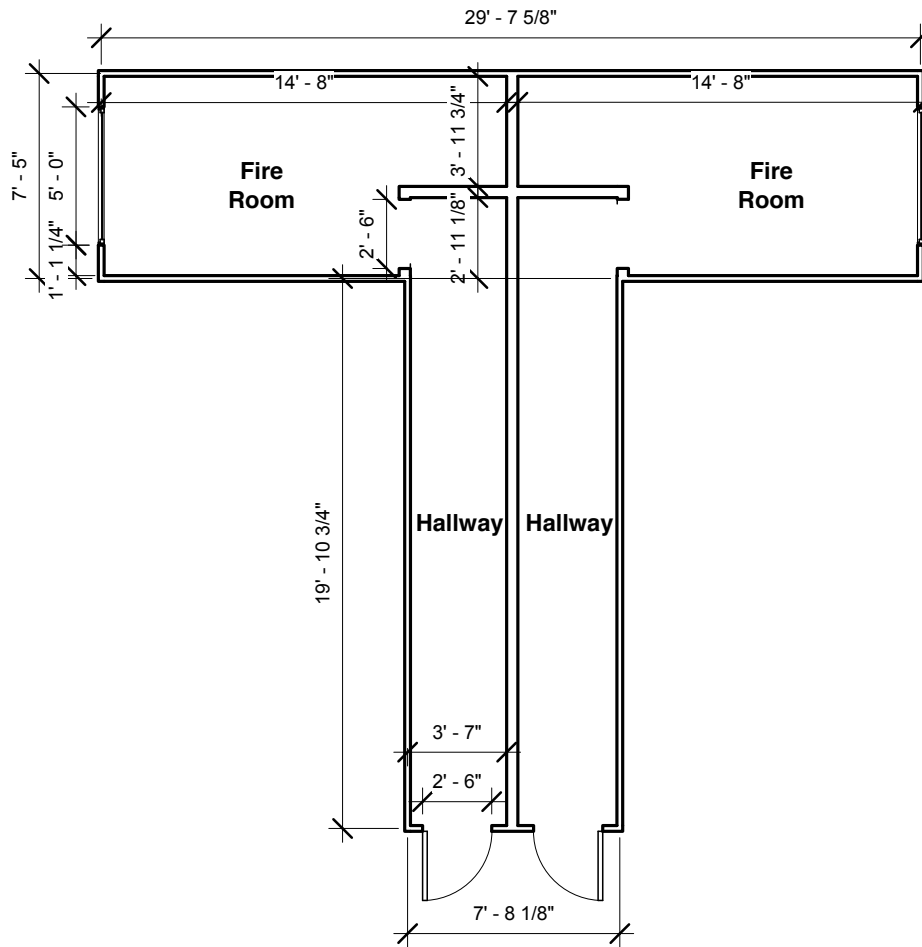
Dimensioned floor plan of the Insulated Metal Prop.
